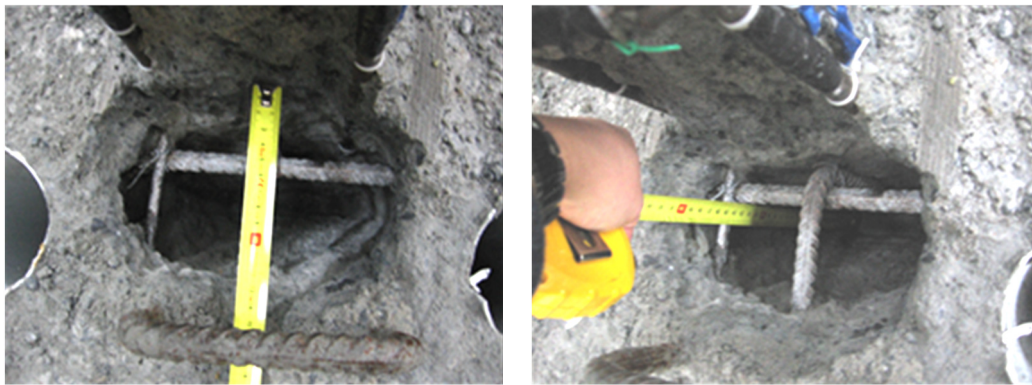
Anchorage holes on the two sides of the columns for embedding the longitudinal FRP reinforcement into the footing.
